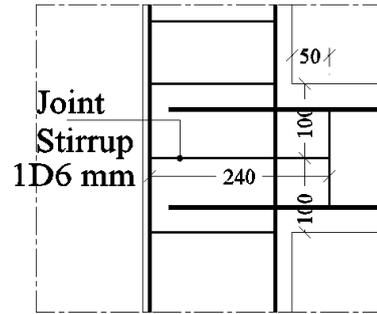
Reinforcement configurations (details of joint A) of the tested specimens Sp2
